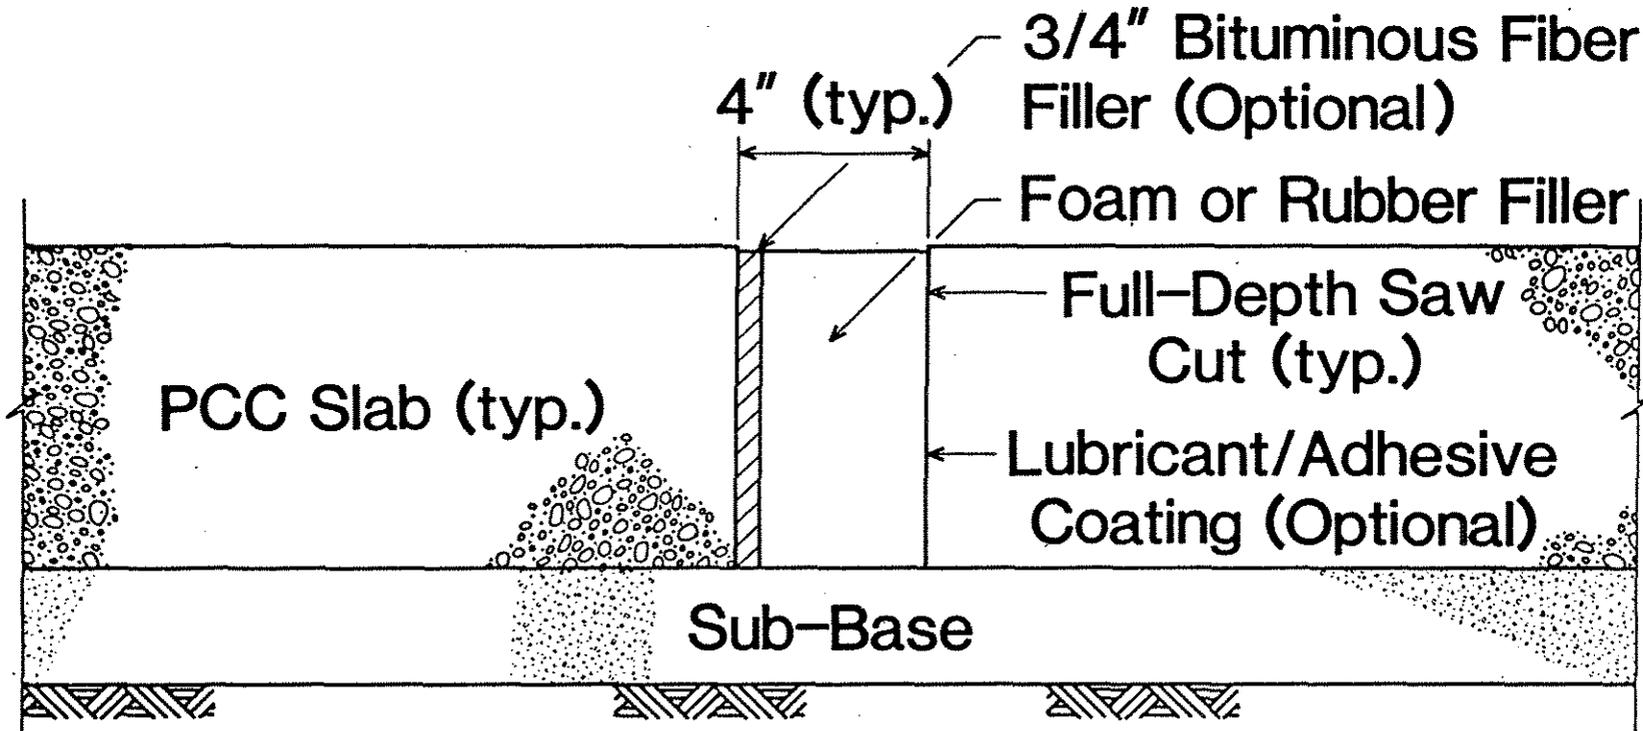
Cross-section of a Typical Non-Bituminous - Filled Pressure Relief Joint Without Load Transfer [1 in = 25.4 mm].
